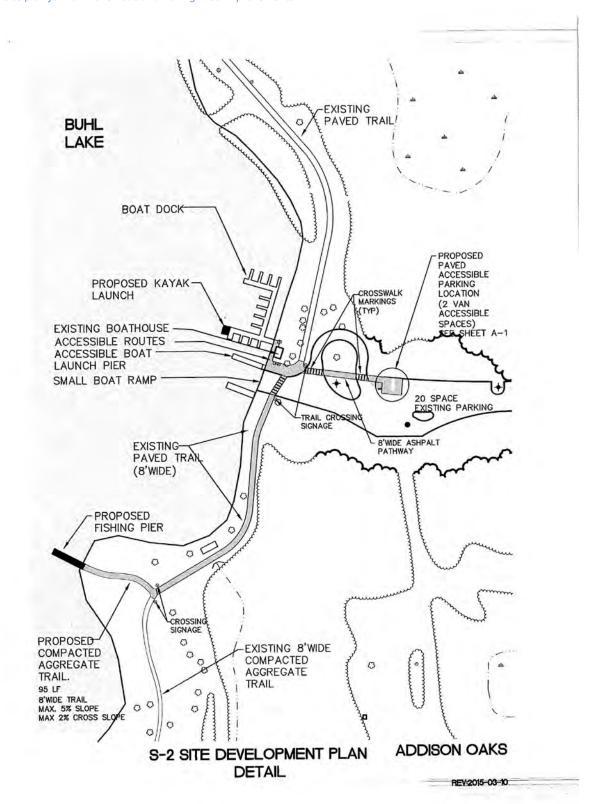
Figure M: Site plan for Buhl Lake Boat and Fishing Area improvements
